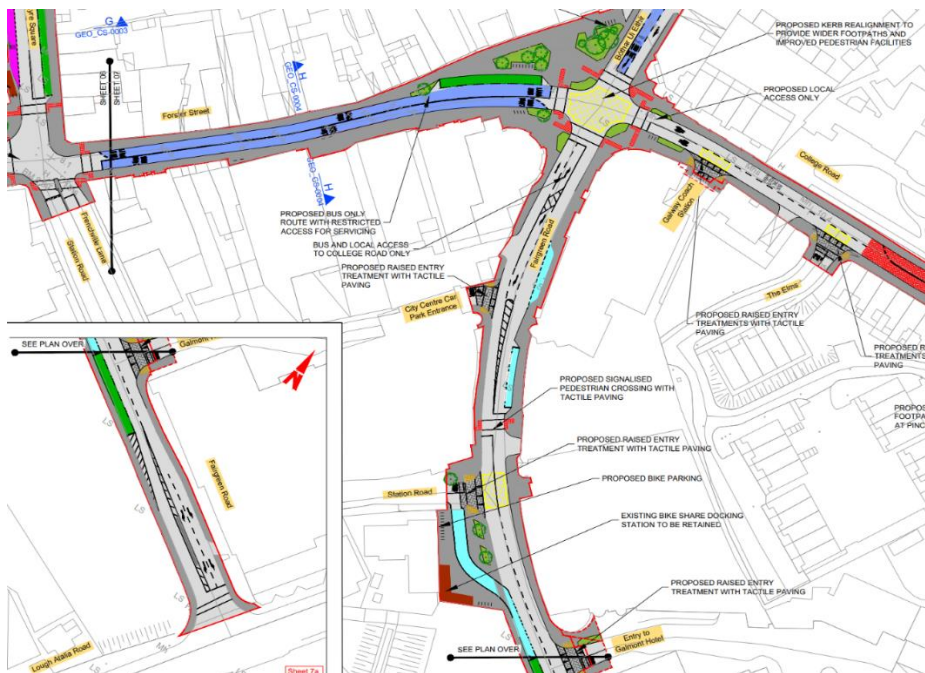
General Arrangement of Proposed Scheme at Fairgreen Road
